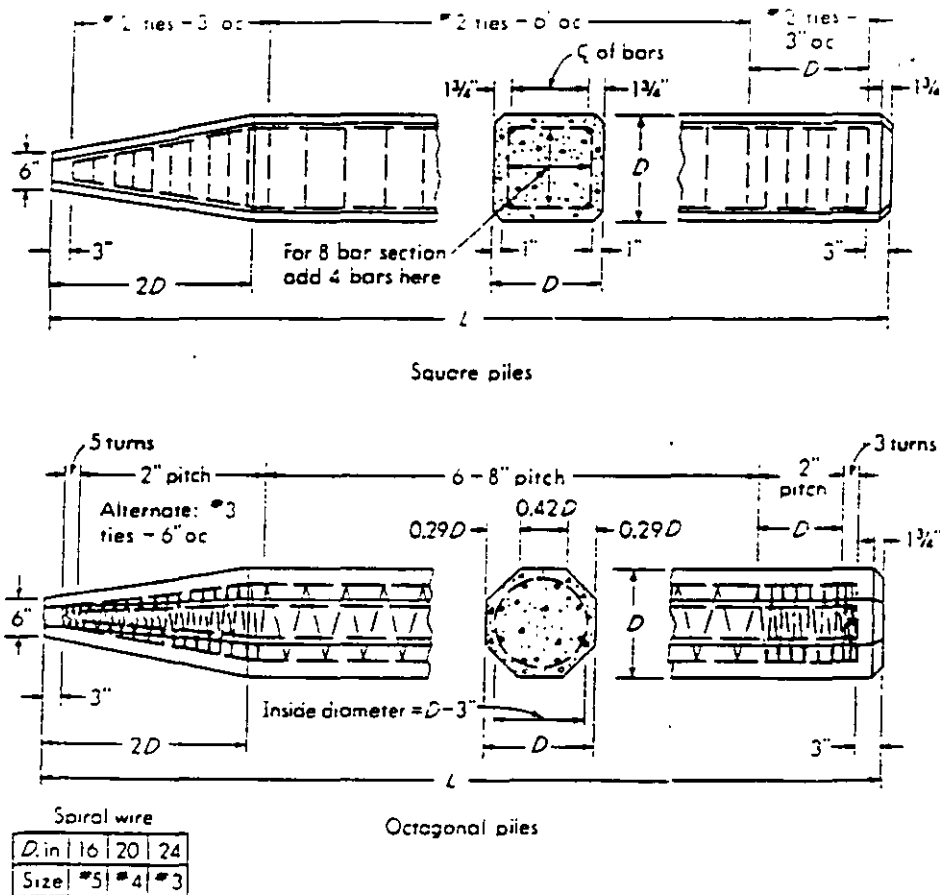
Typical details of precast concrete piles. (After Chellis [9].)
